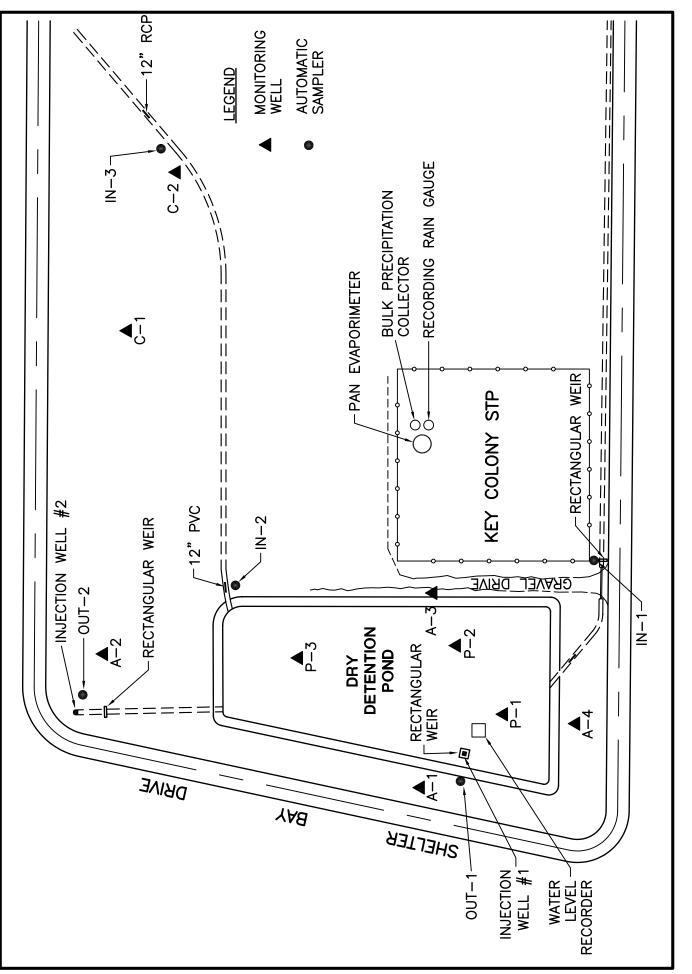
Field Instrumentation for the Dry Detention Pond Study Site.
